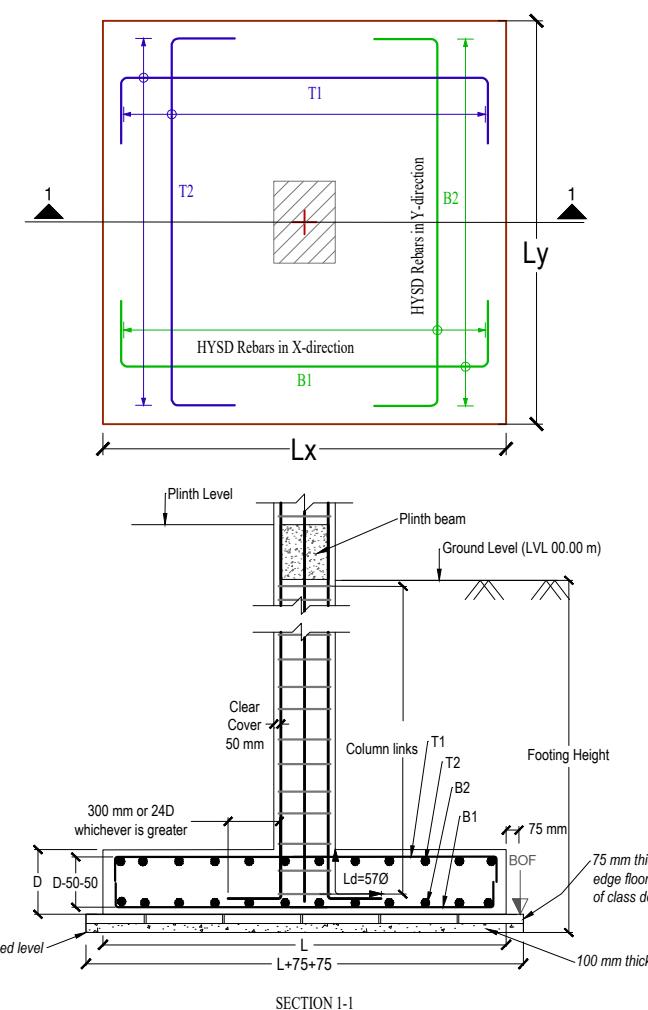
SECTION PLAN &amp; ELEVATION OF TYPICALLY ISOLATED FOOTING DETAILED
